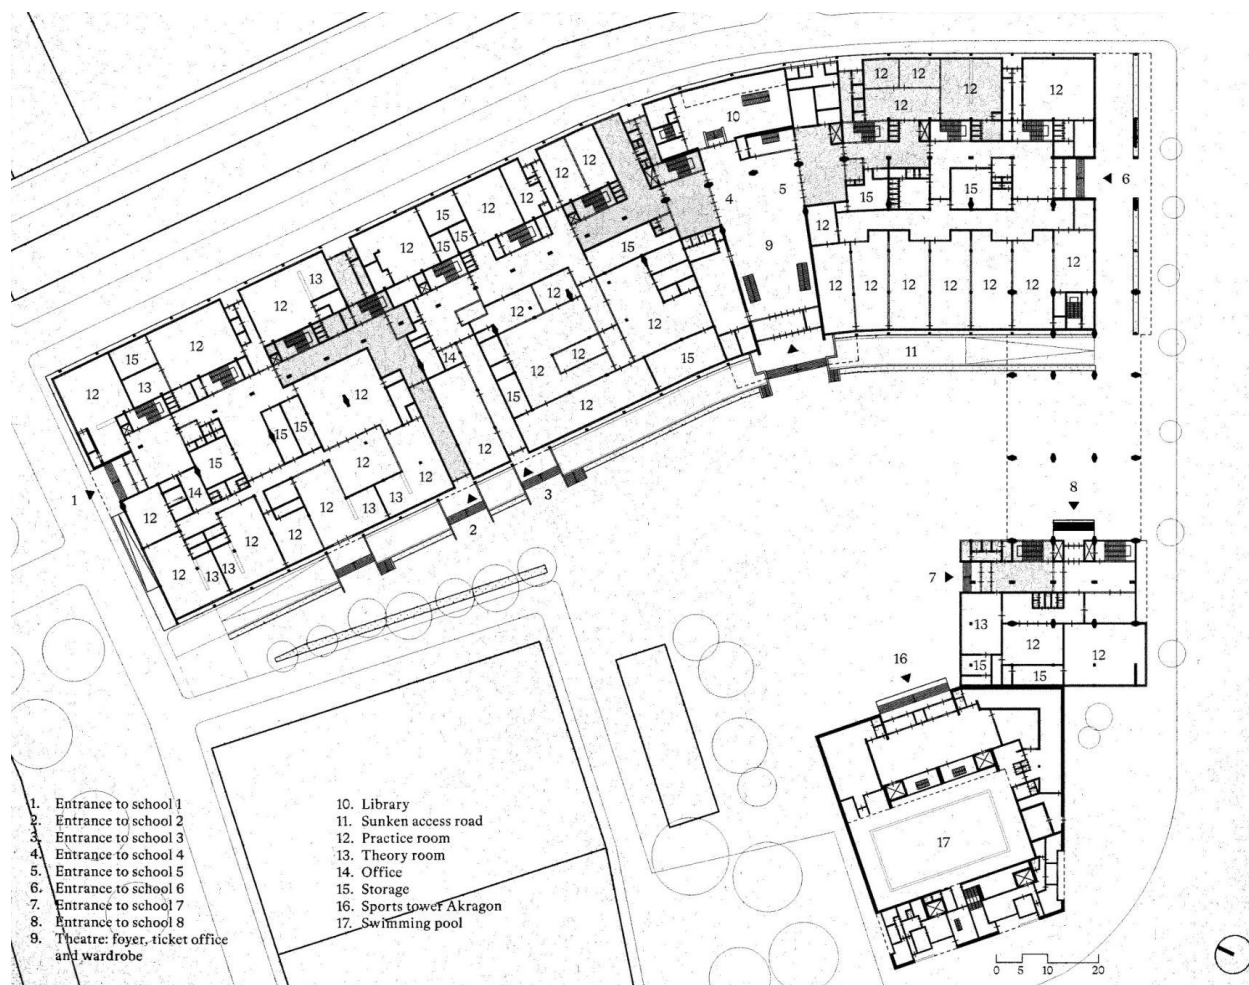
Ground floor plan Technikon complex, current situation. (source: (Pietsch et al., 2018)).
